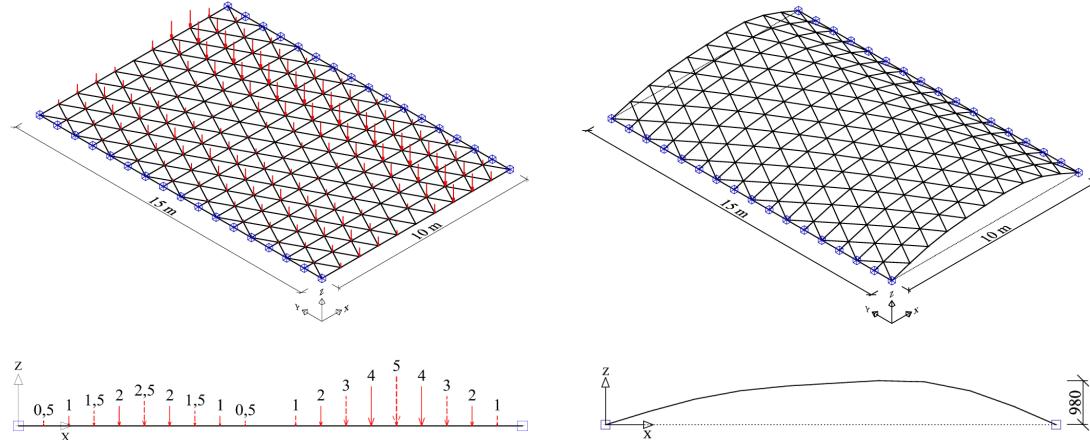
The initial ground plan and the final shape (unsymmetrical external load)
